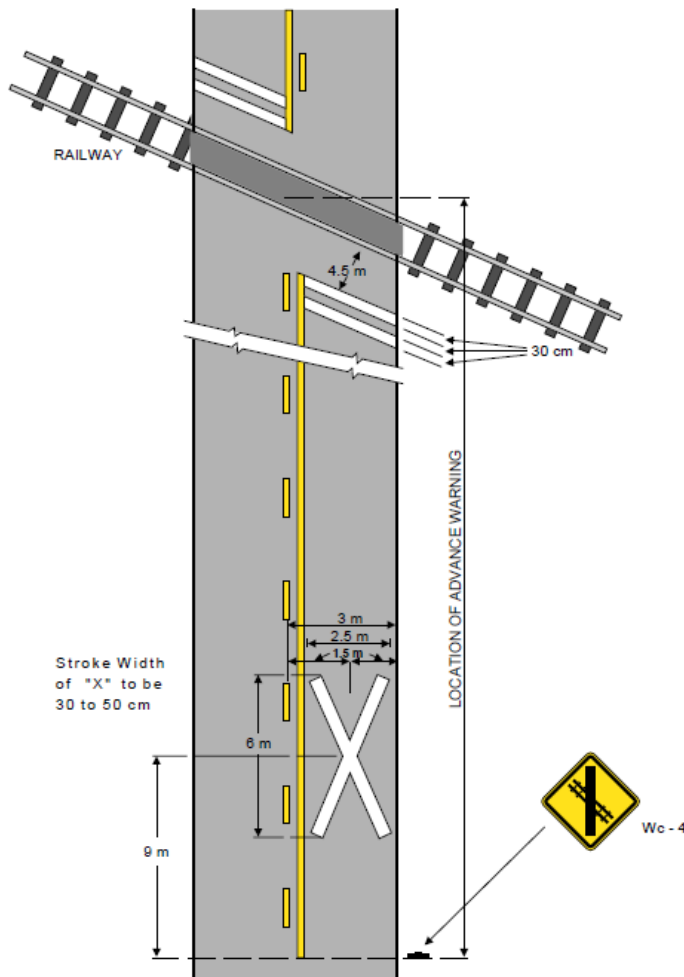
At-Grade Rail Crossing Pavement Marking and Signage Standard
